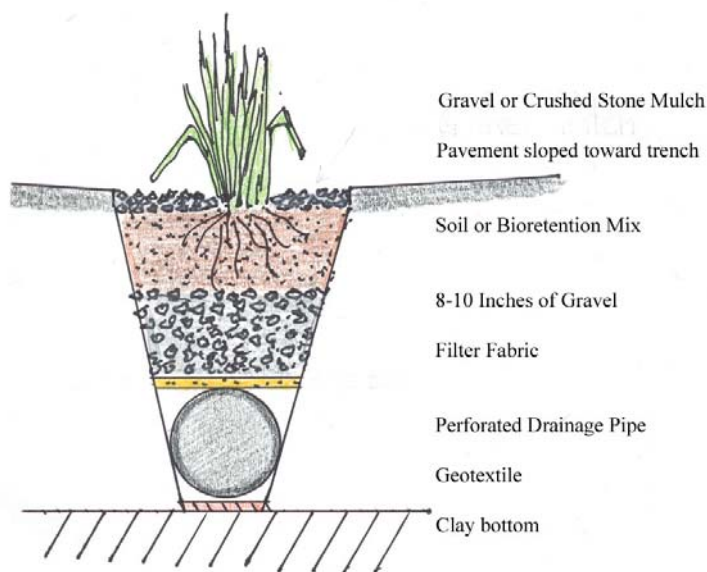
Structural layers of infiltration trench for parking lot runoff.
